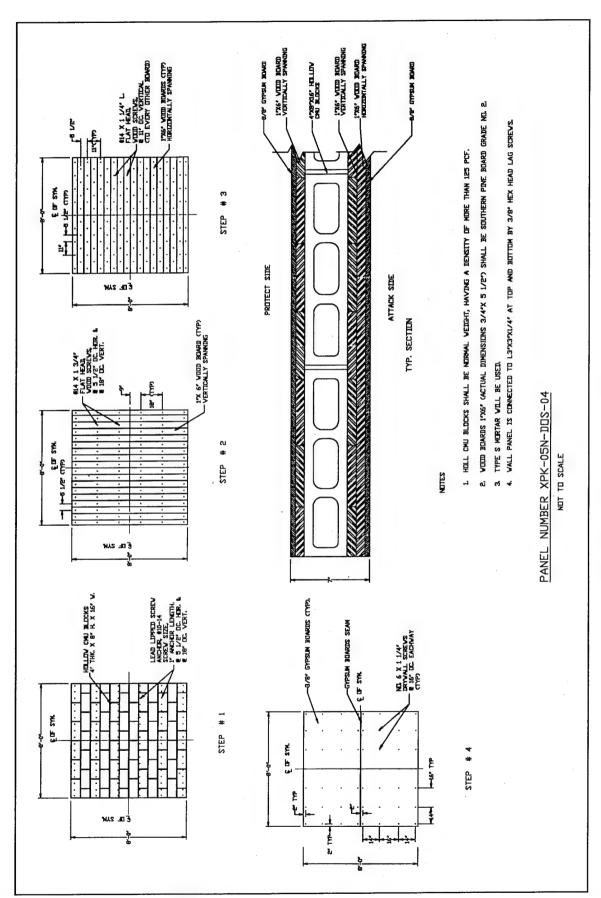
Engineering drawings for wall panel XPK-05N-DOS-04 (non-SI units)
